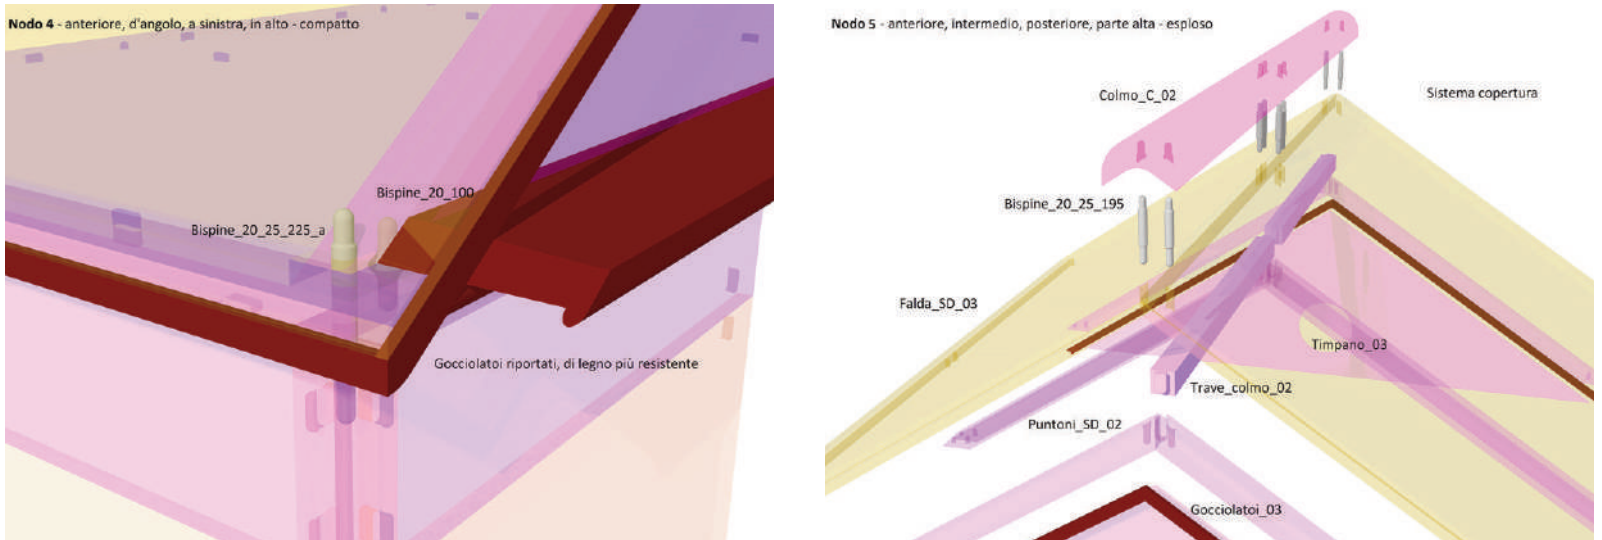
, 10 - Left: Compact perspective view Node 4, located on the top area close to the lower part of the roofing pitch. Right: Exploded perspective view Node 5 located on the top area.
